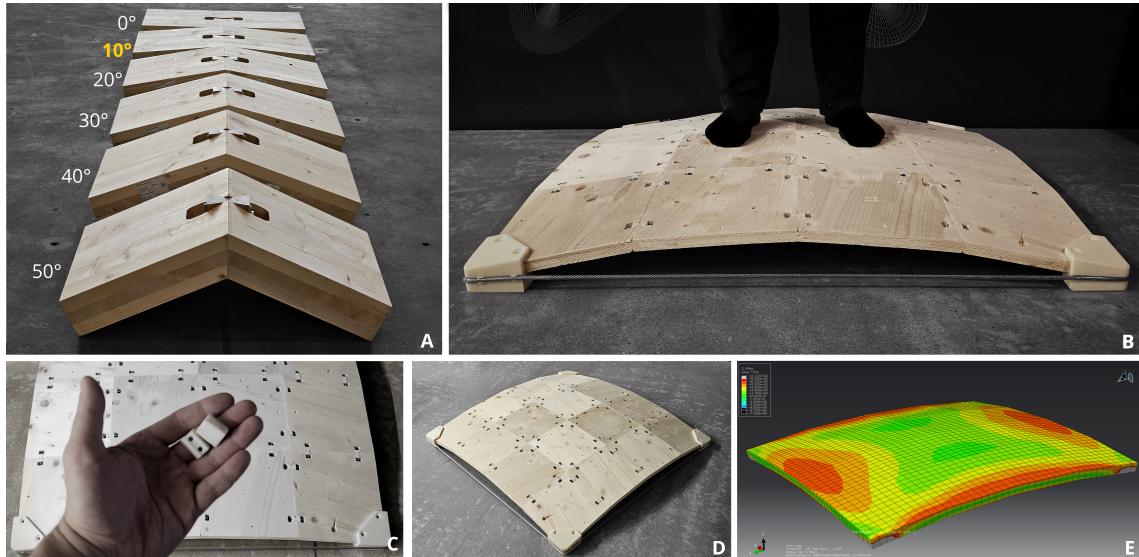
A - 120 mm CLT and joinery angle check, B - plate and cable, C - printed 19 mm joints, D - vault di-hedral angles are within 10°, E - stress analysis showing concentration of forces on shell edges twice to joint capacity.
